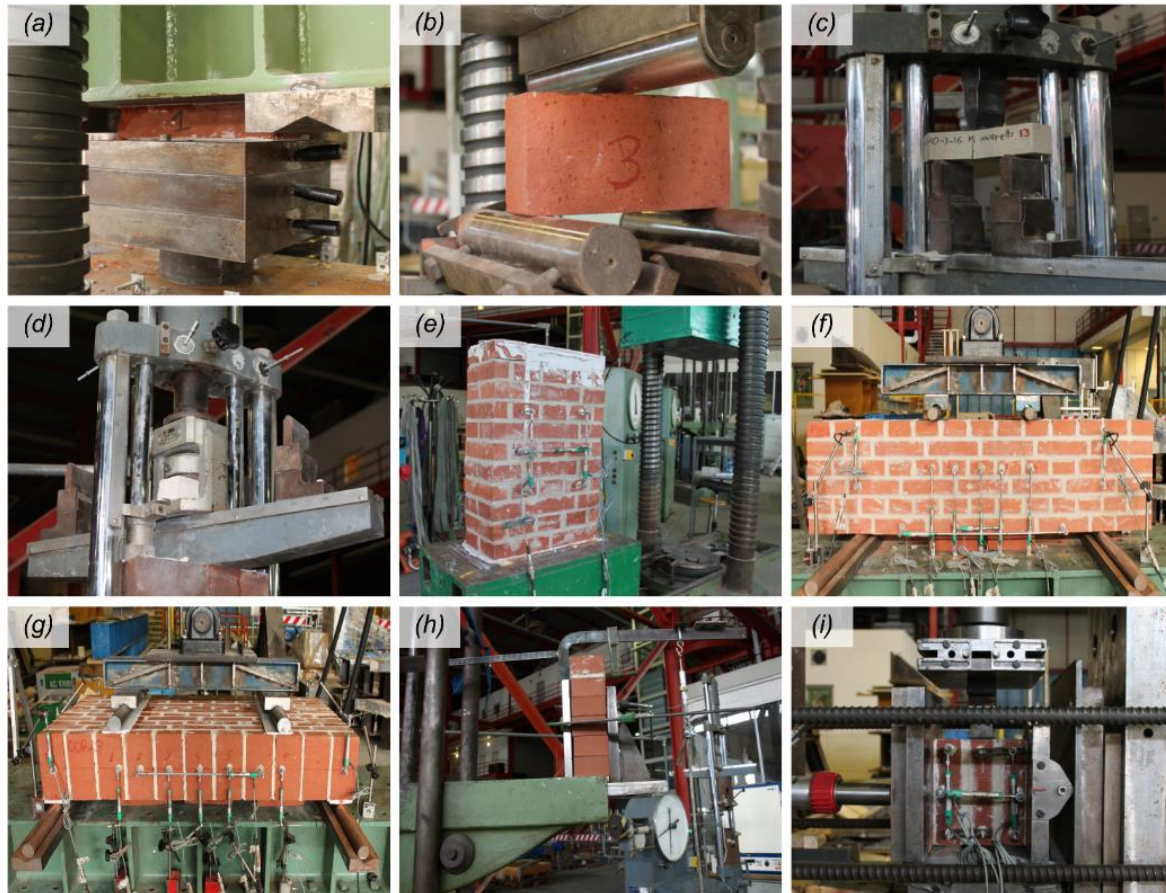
Mechanical characterisation tests: (a) compression test on a clay brick; (b) three-points bending test on a clay brick; (c) three-points bending test on a mortar specimen; (d) compression test on a mortar specimen; (e) compression test on a masonry wallette; (f) four-points in-plane bending test; (g) four-points out-of-plane bending test; (h) bond wrench test; (i) shear test on a triplet [19]
